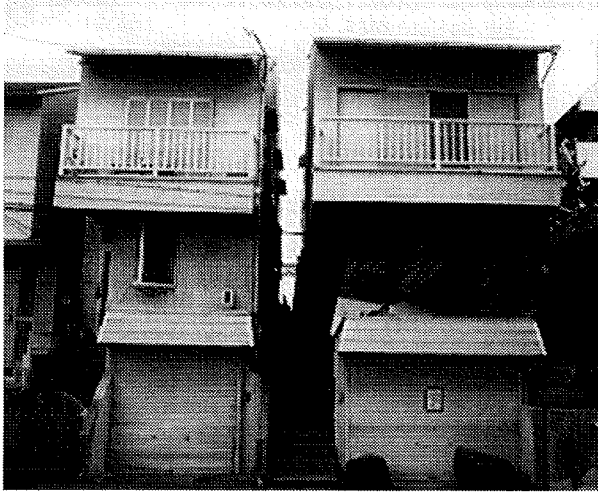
Damage of the second story. The first story was a garage of reinforced concrete.
